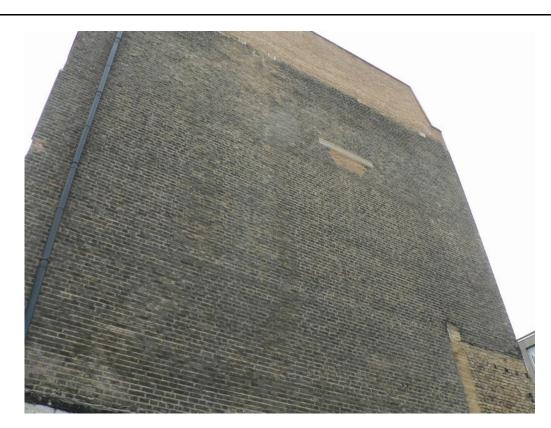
8-9 Hayne Street, northern elevation, note modern attic storey visible through modern brick
